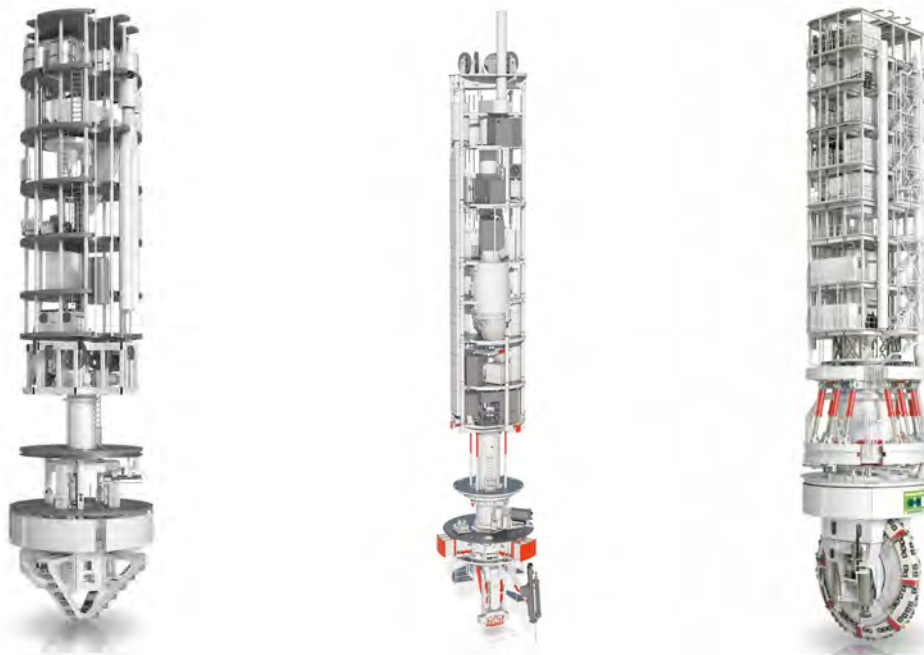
Herrenknecht AG equipment for continuous shaft sinking (f.l.t.r.): Shaft Boring Cutterhead (SBC, 8-9m diameter), Shaft Boring Roadheader (SBR, 7-12m diameter) and Shaft Boring Machine (SBM, 10-12m diameter) (www.herrenknecht.com/en/products/mining/)
